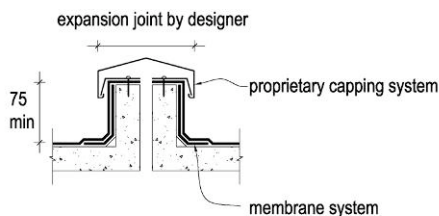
Metal expansion joint cap, single-sloped, fixed one side
